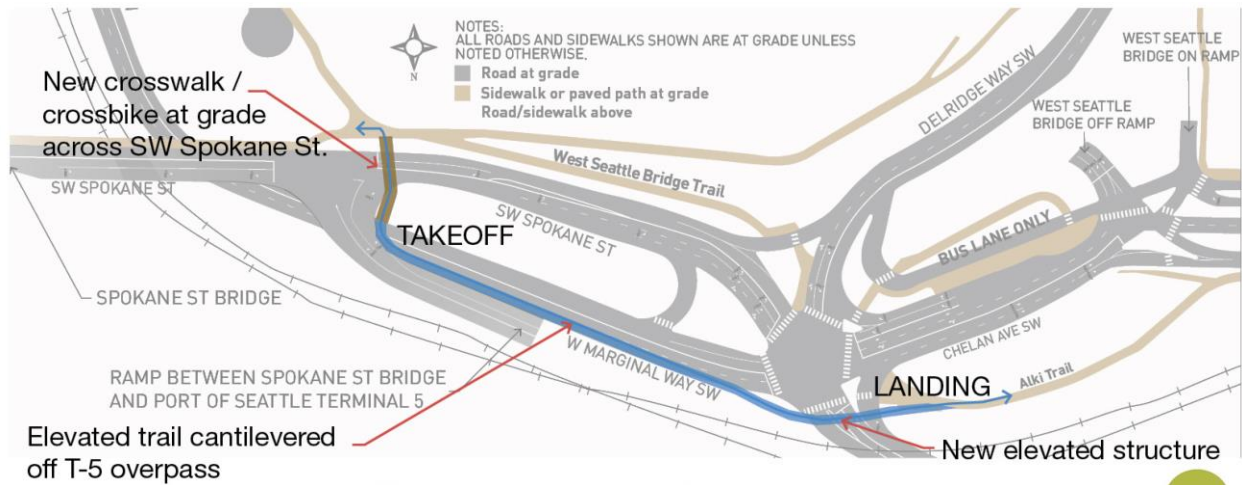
Elevated Crossing Cantilevered from Terminal 5 Overpass (Long-Term)
